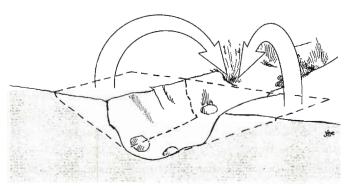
Cut back steep unstabilized slopes before digging anchoring trench, and cast the dirt to the upslope side of the dam.
